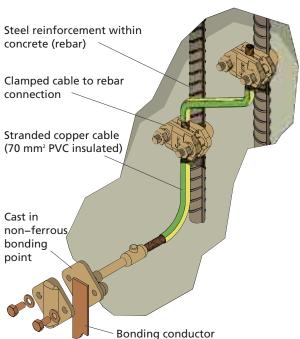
Typical methods of bonding to steel reinforcement within concrete
